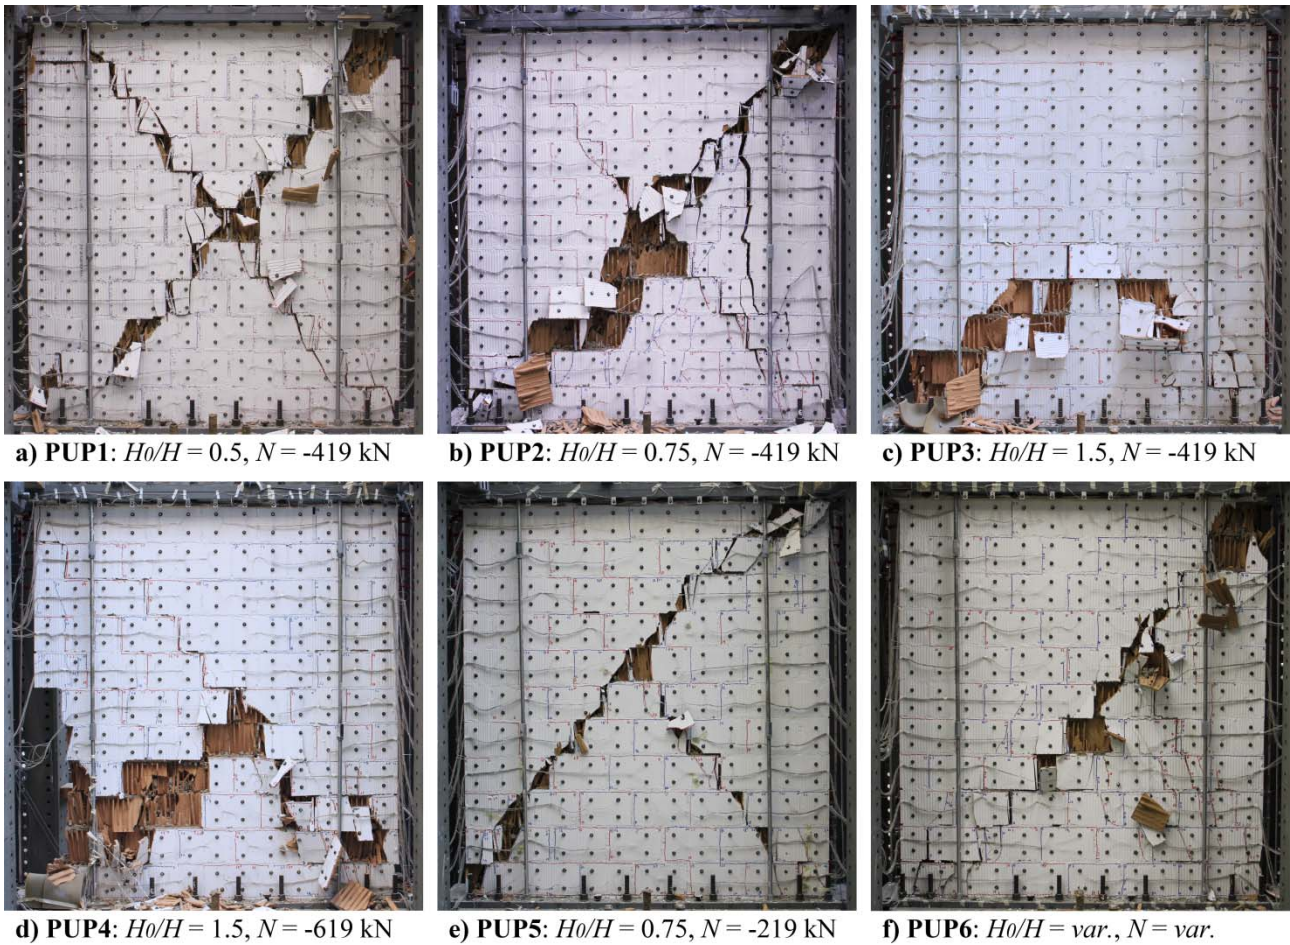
Full-scale tests on URM walls: Crack patterns at failure [15], [17].
